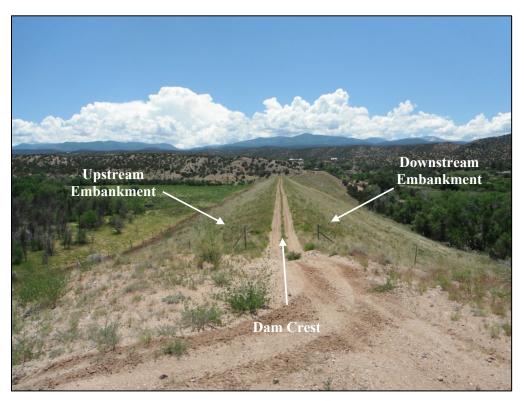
Dam Embankment (Standing on the dam embankment looking southeast across the dam crest)
